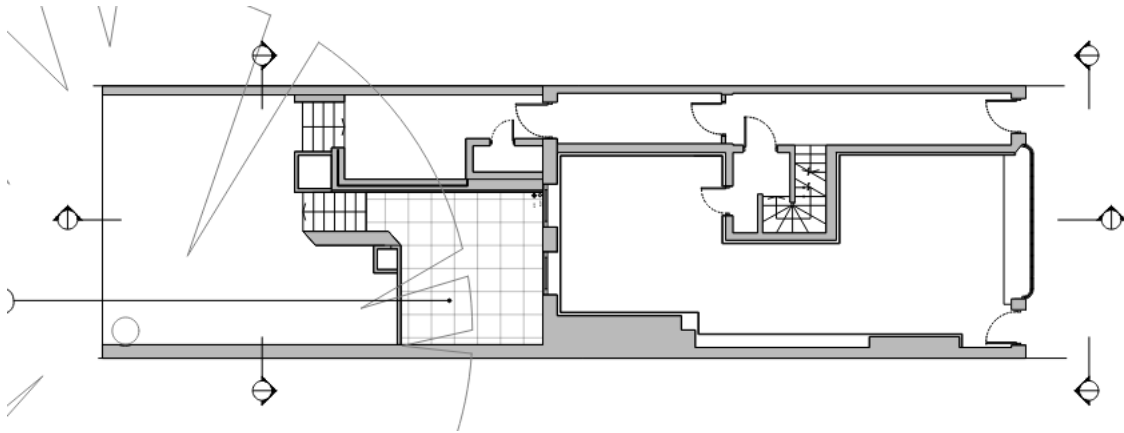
(above): Proposed ground floor plan (source: proposed drawings)
